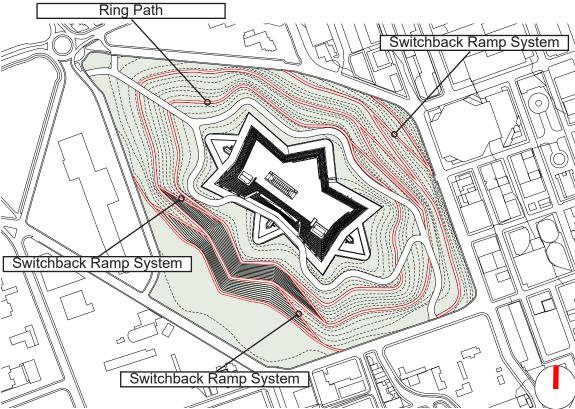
Proposed Ring Path Network and Switchback Ramp System
